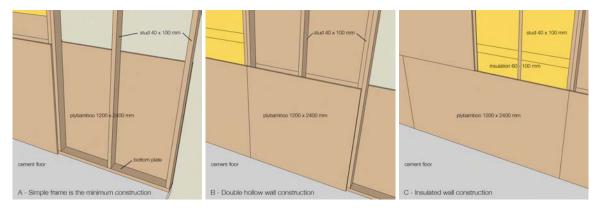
Expanding wall system. From single sheet wall to complete insulated sandwich wall. (Structure A to C)
